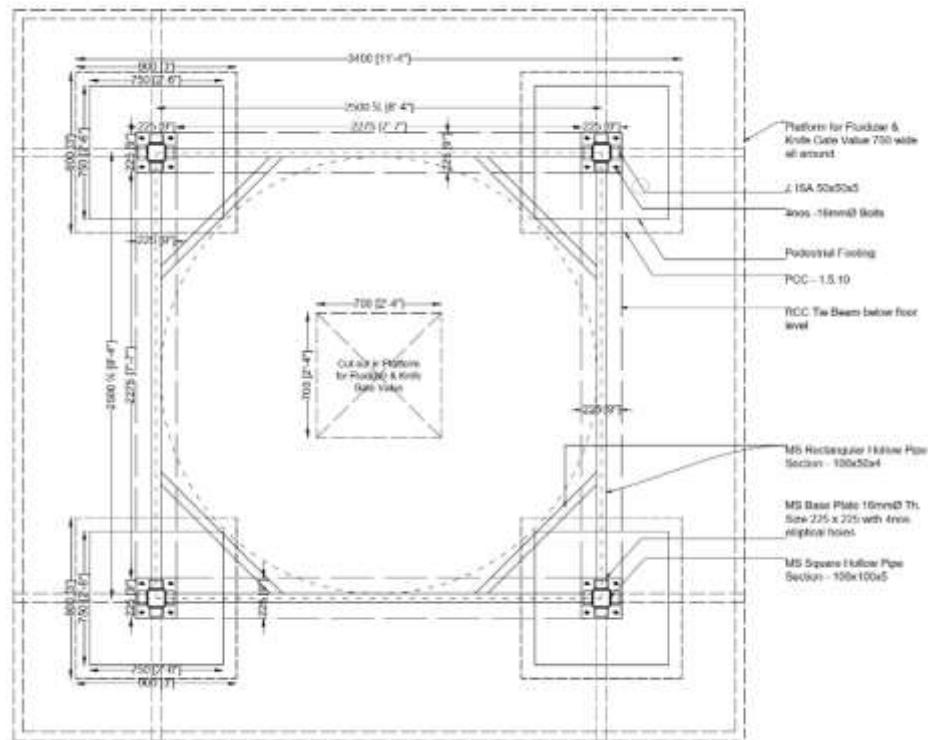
Plan of the supporting structure for positive pressure system stacked-up assembly
